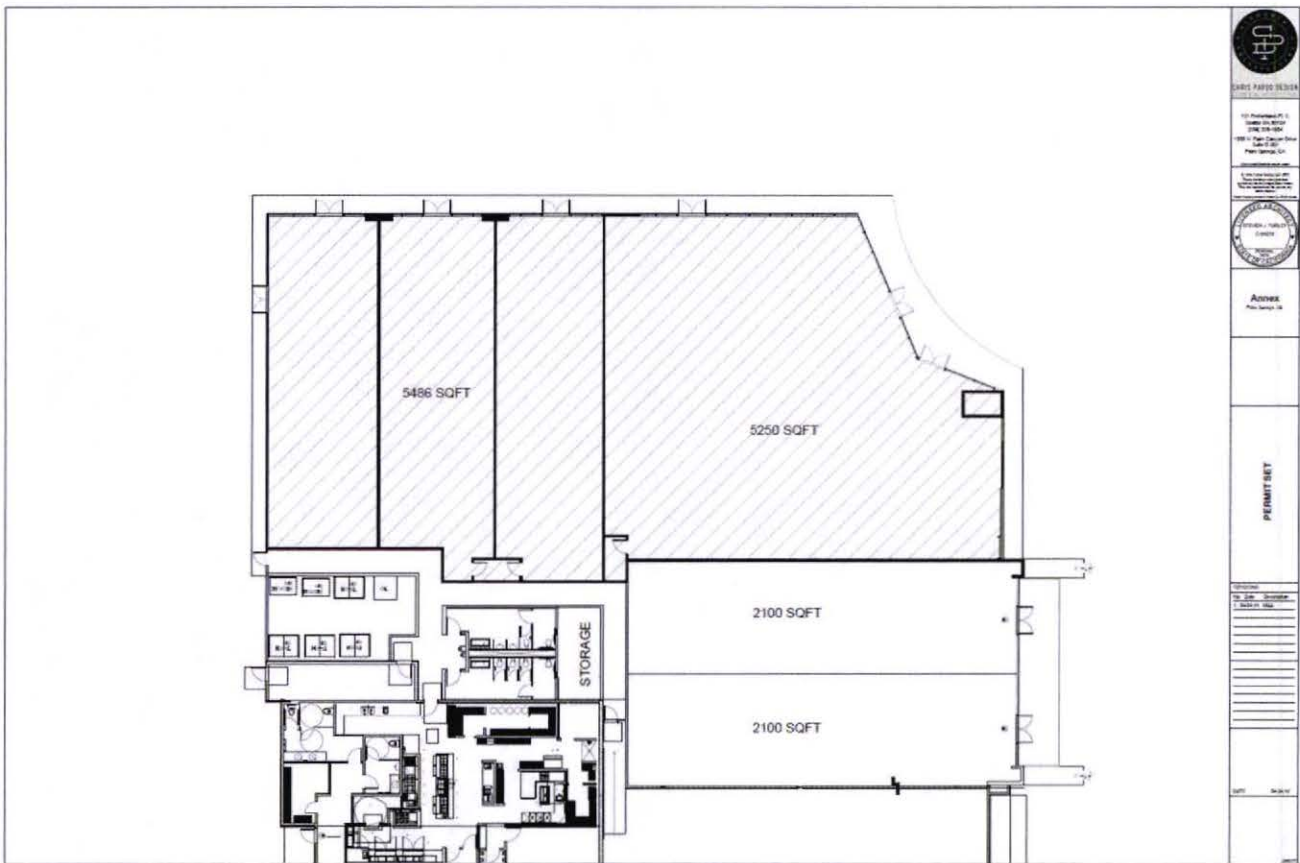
Revised Site Plan – Block C (“Annex” Building)
